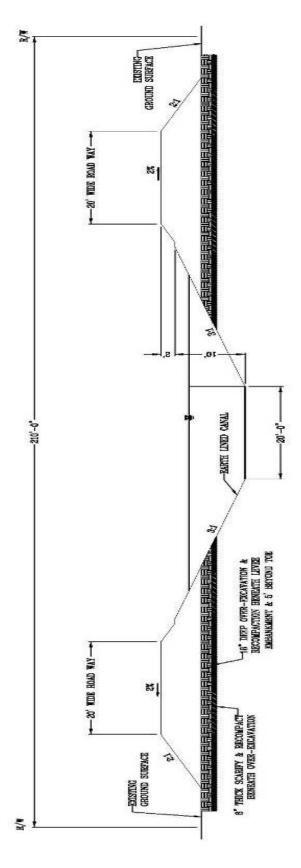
Preliminary Canal Cross-Section with 3:1 Side Slopes
